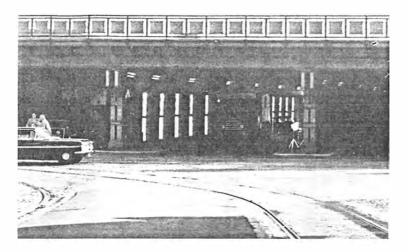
Tunnel Vaillantlaan, 's-Gravenhage.
